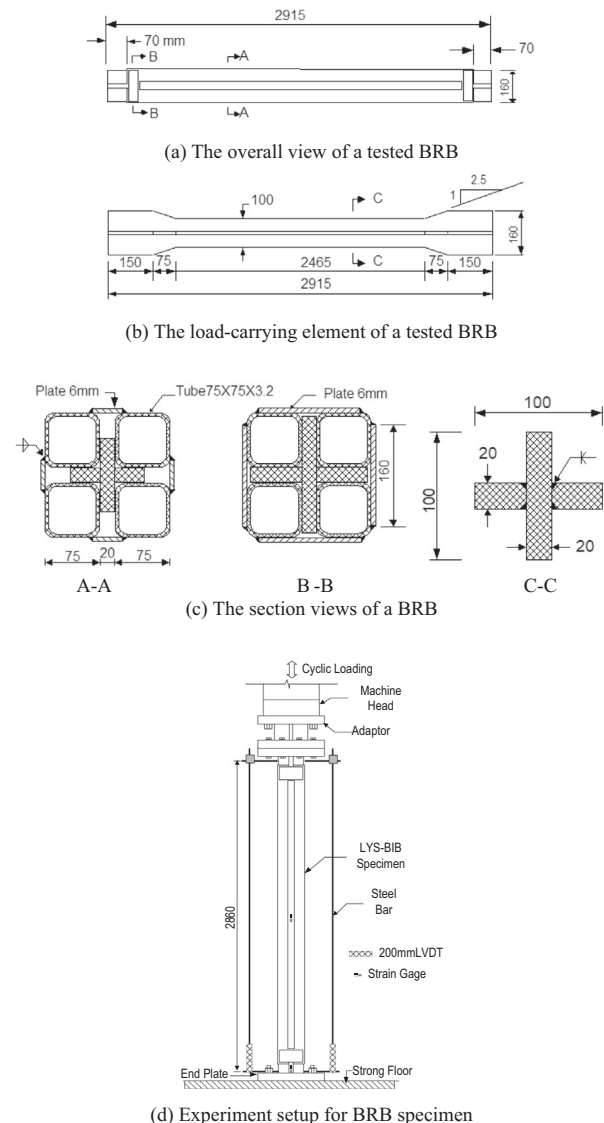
(a) The overall view of a BRB (b) The load-carrying element of a BRB (c) The section views of a BRB (d) Experiment setup for BRB specimen.
